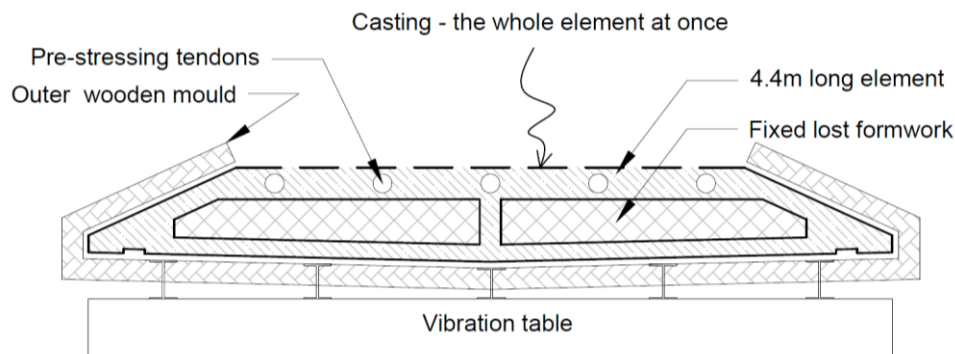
Setup for casting of one deck element. The rib in the middle of cross-section does not have any structural function. It only allows better control of casting of the bottom slab.
